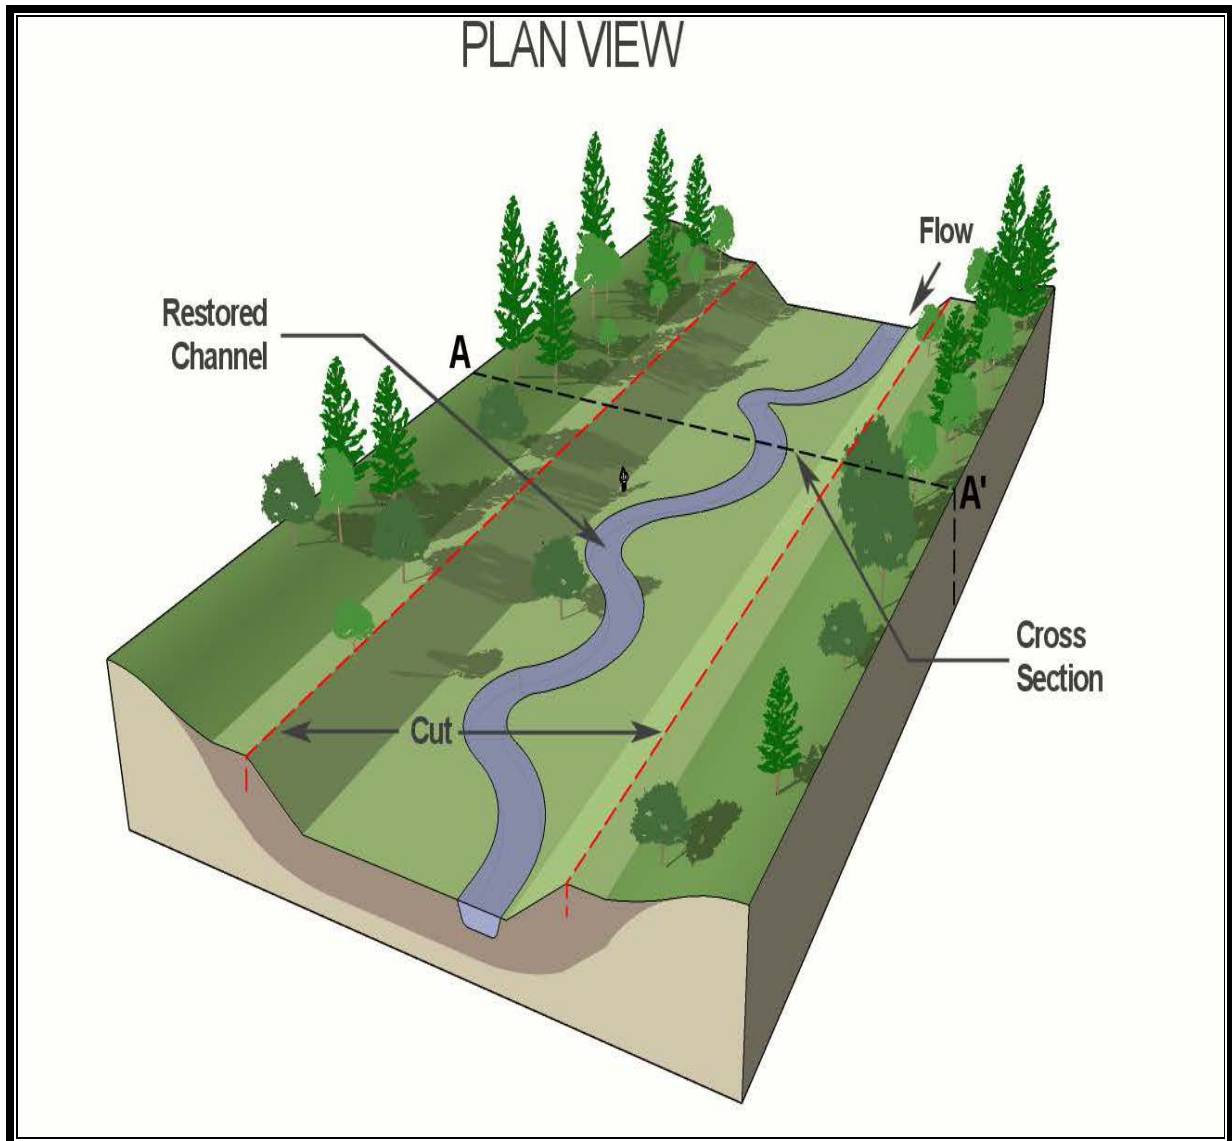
P3-FLOODPLAIN BENCH APPROACH-PLAN VIEW
